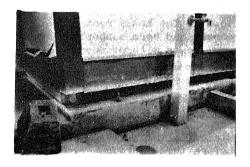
An anchorbolt was not nutted up to the sill due to lack of its projection. The sill lifted up.
